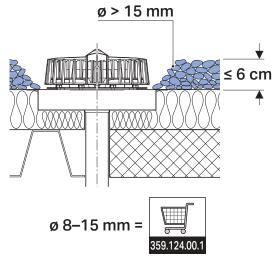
Geberit Pluvia roof outlets 12 I and 25 I with roof gravelling
